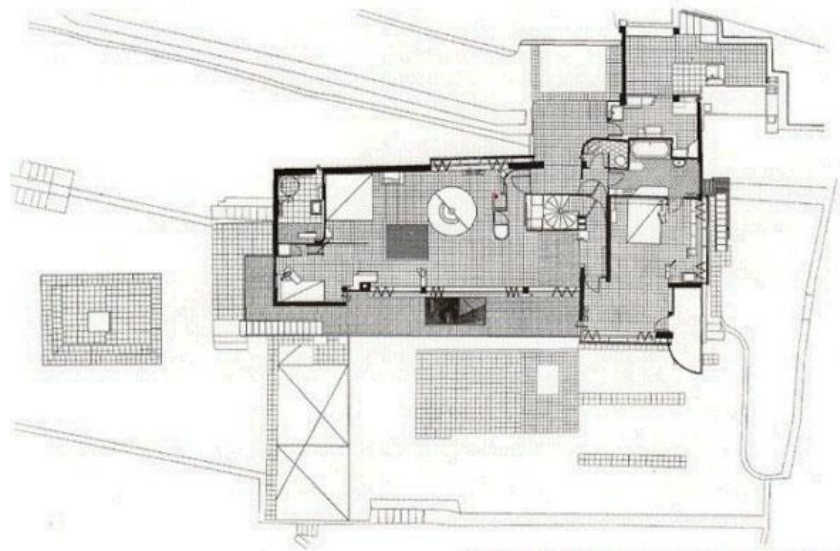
E-1027: Upper ground floor (main level) plan, 1929. Drawing © Renaud Barrès/Mairie de Roquebrune.
